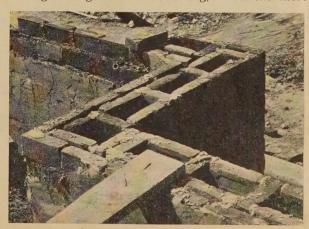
Foundation wall below grade of apartment buildings shown in Fig. 5. 12" all-rolok wall in Flemish bond.
